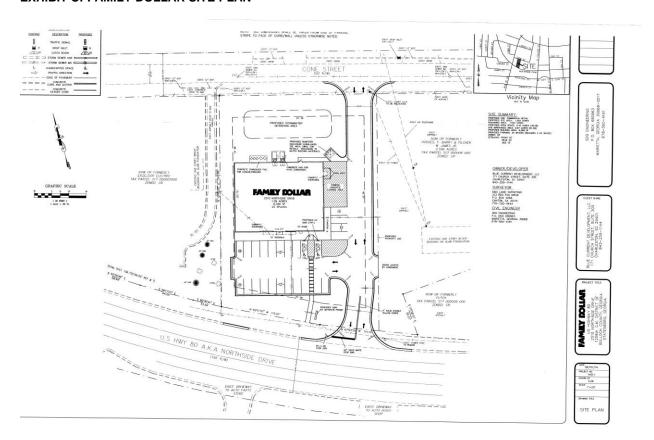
EXHIBIT C: FAMILY DOLLAR SITE PLAN
